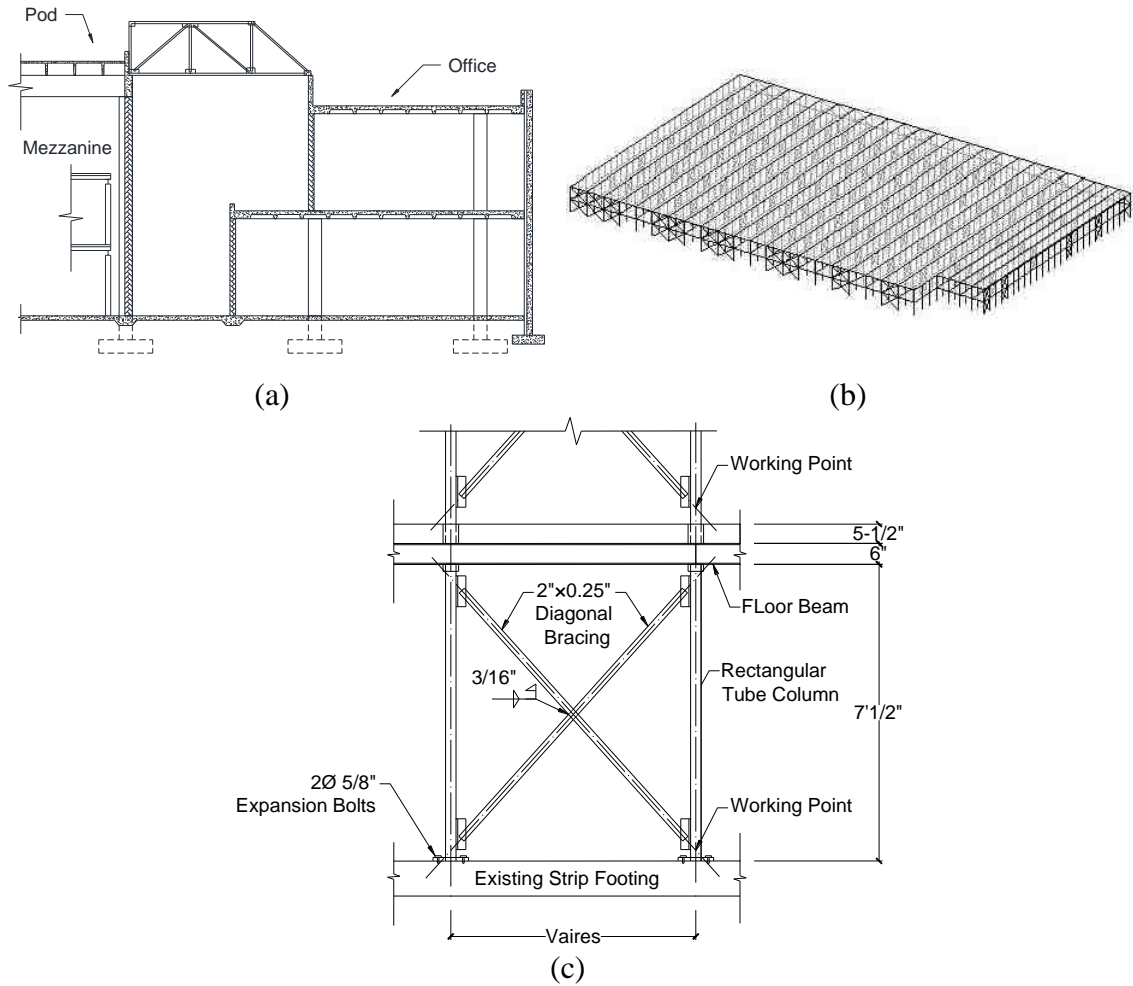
(a) Typical elevation of Pod, Office and mezzanine; (b) Steel mezzanine inside Pod; (c) Typical braced bay
